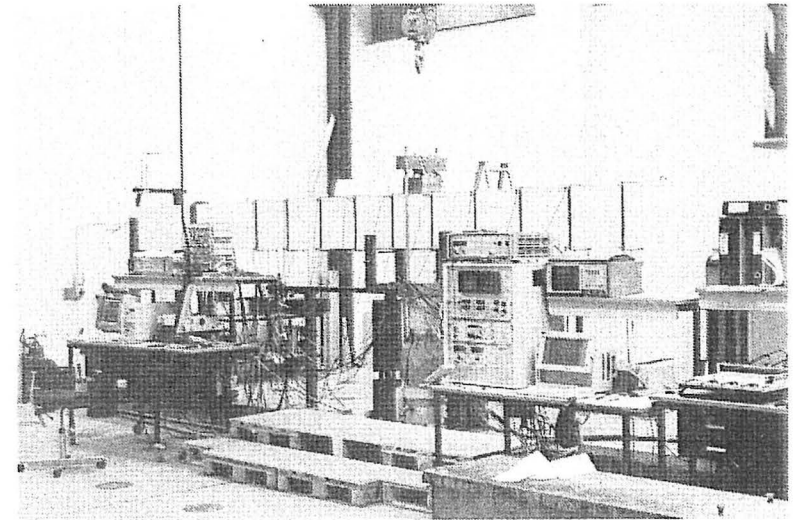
Photo of the test set-up for beams with the size: span 4800 mm; depth 400 mm; width 200 mm.
